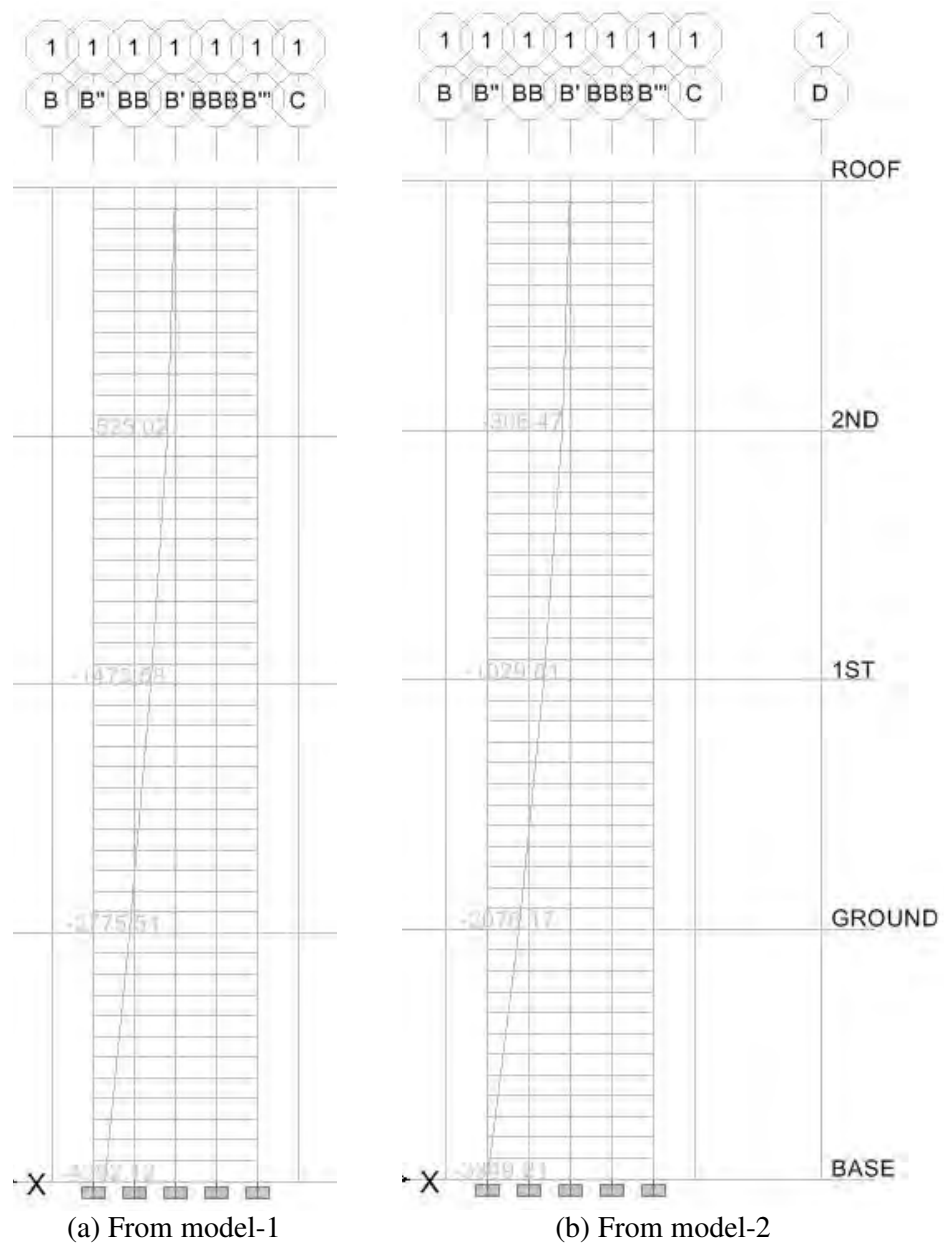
Moment diagram for wall-1 of arrangement -3
